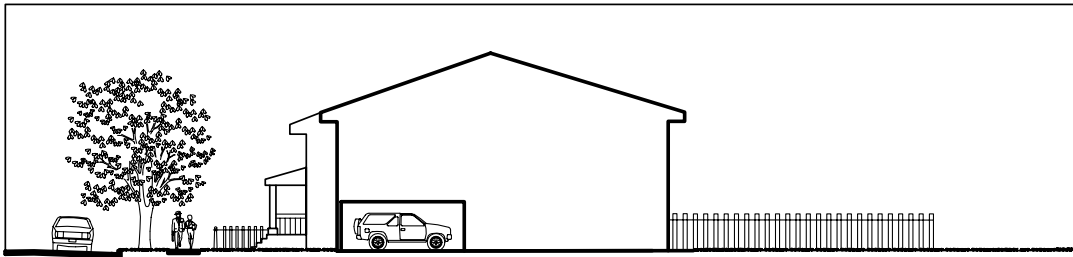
Front yard setbacks should generally be a minimum of 4.5 metres for single-detached, townhouse, and multiplex lots.
